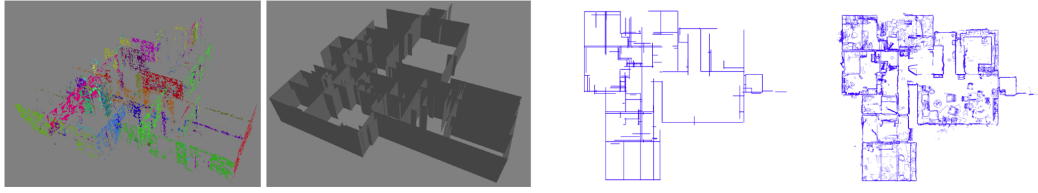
First: DBSCAN clustering results for B2. Second: plane-fitted flat walls. Third: drafting-style floor plan. Fourth: (c) pen-and-ink style floor plan.
